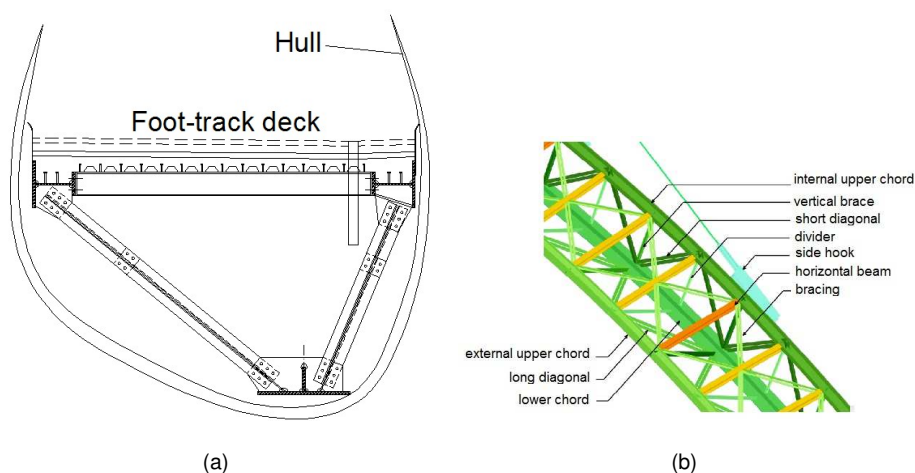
Footbridge deck details: a) section with hulls; b) typical elements of the deck.
